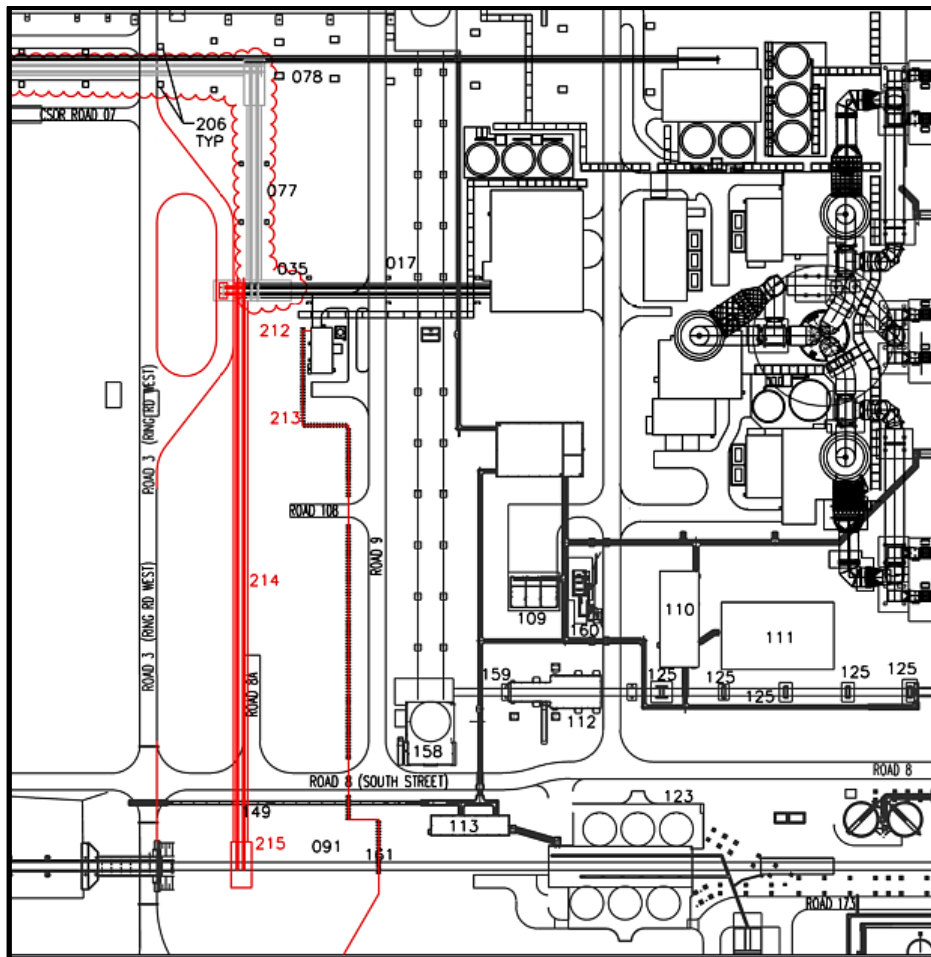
Excerpt of the gypsum link conveyor and transfer house between the gypsum dewatering plant and existing overland ash conveyor
